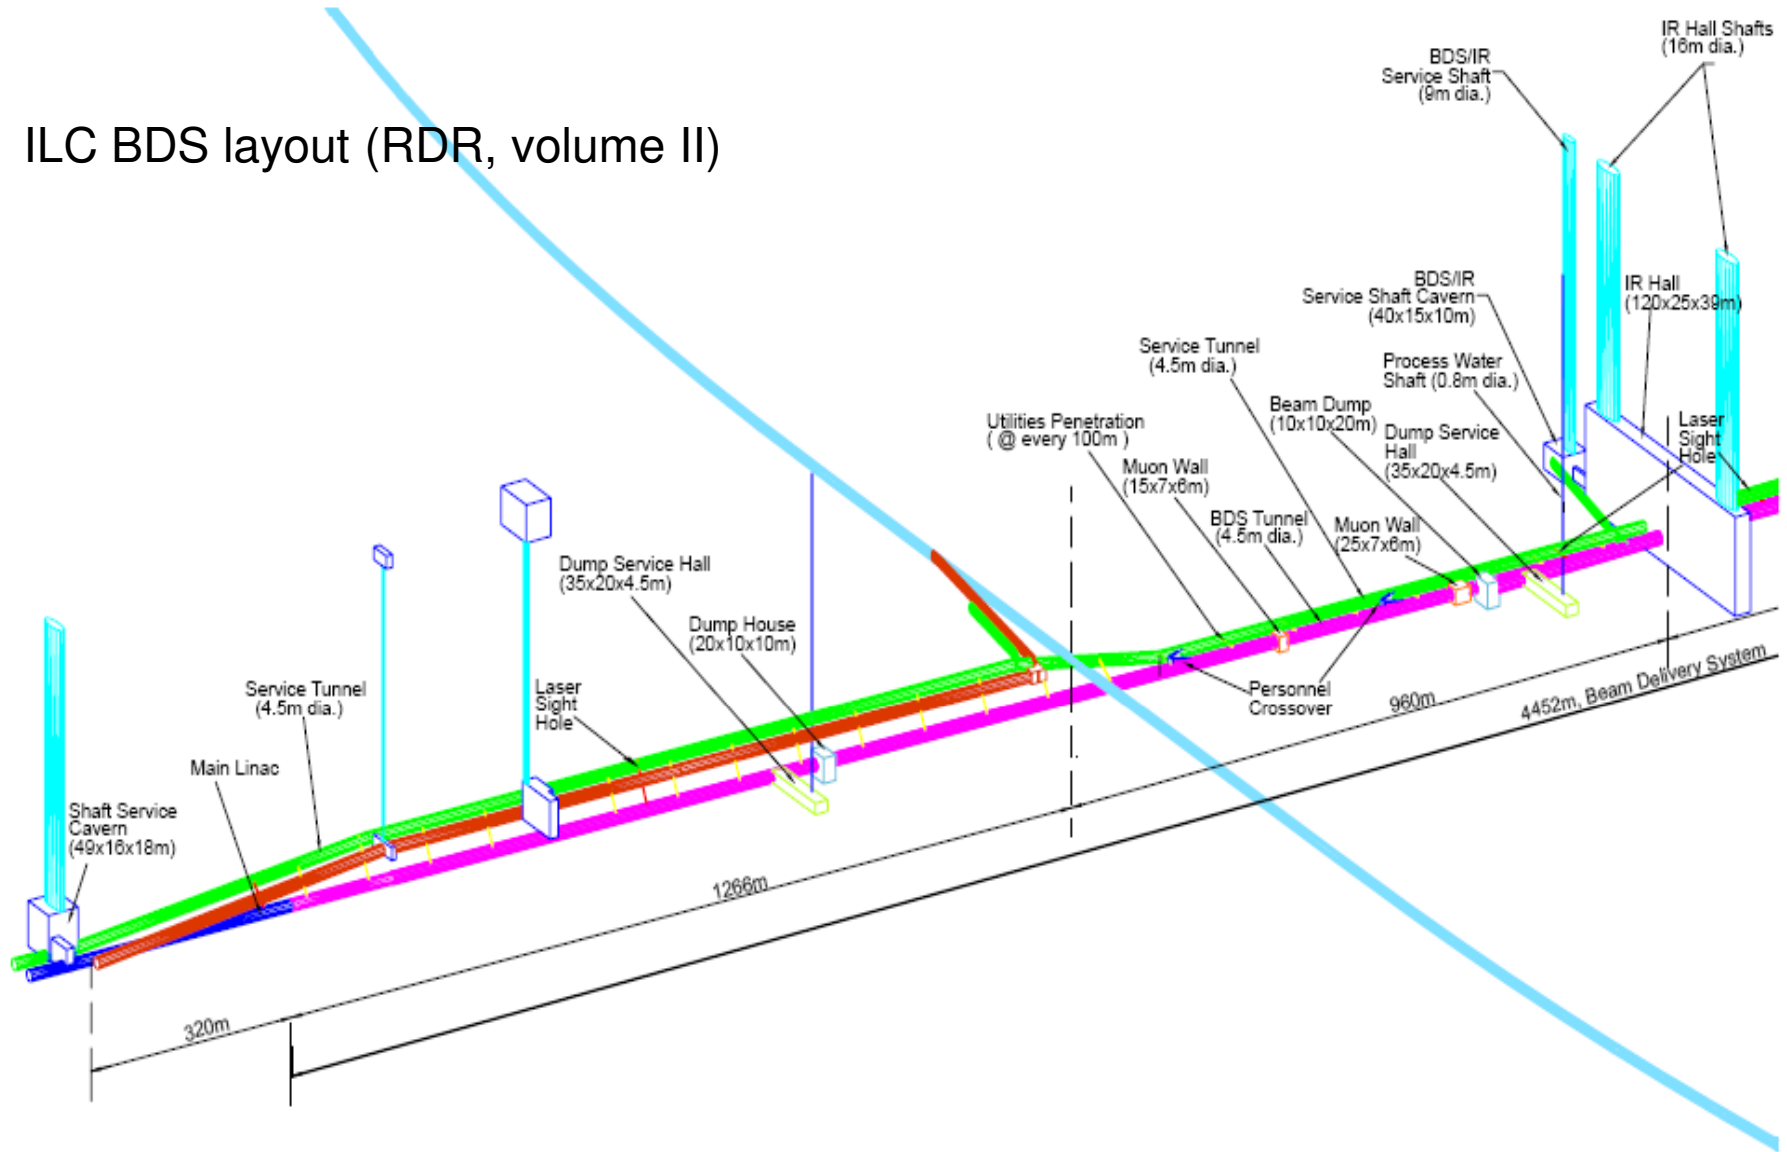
BDS layout, beam and service tunnels (shown in magenta and green), shafts, experimental hall.
